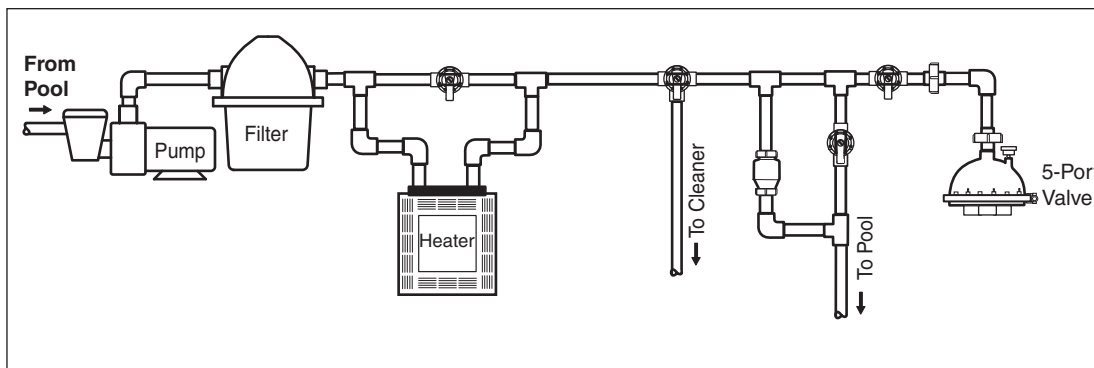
Example of a Plumbing Setup with Auxiliary Equipment
